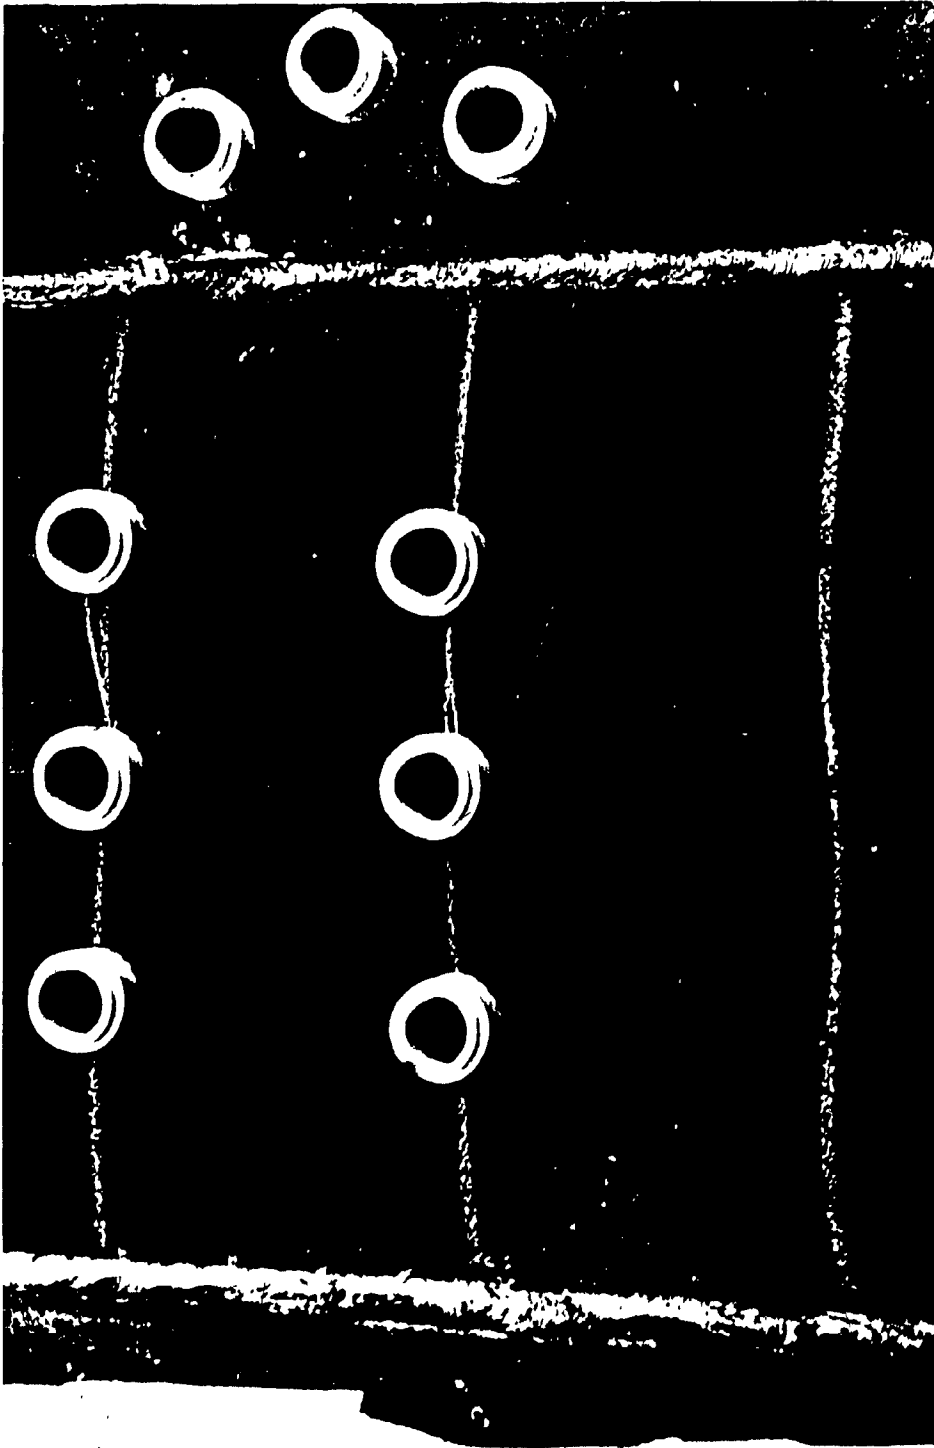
Welding of Nelson shear-studs.
